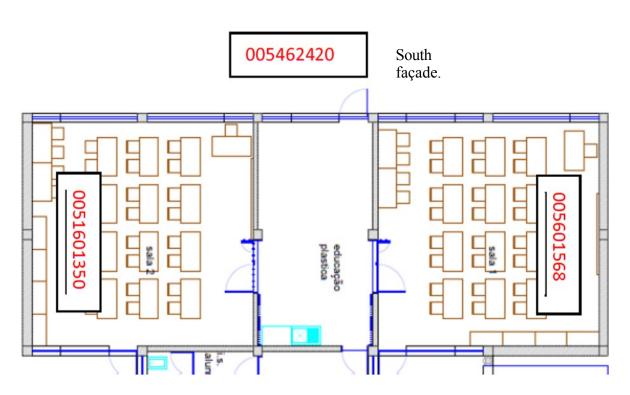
Sensors installed in the classrooms on the second floor and the one located outside on the south façade.
